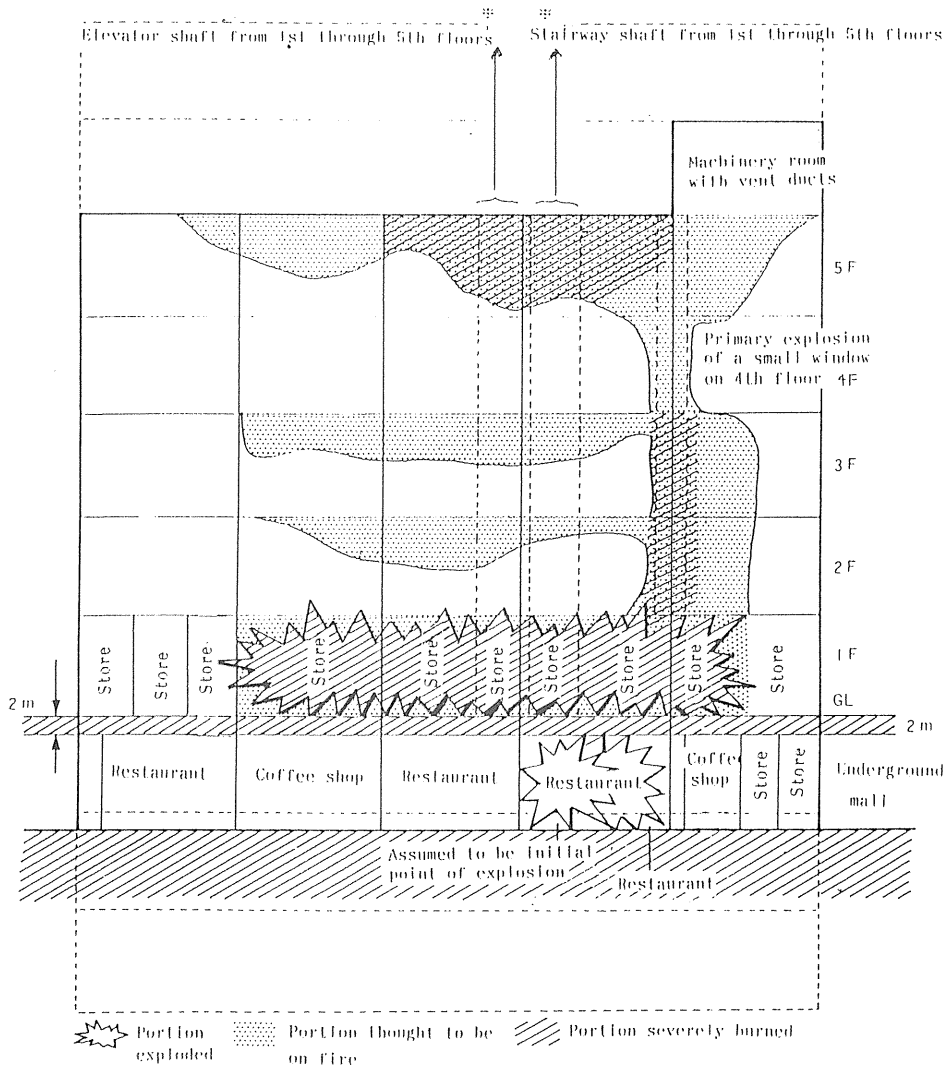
Sketch of gas explosion and fire spread in the Golden Underground Mall and Daiichi Building in the Shizuoka Prefecture (Source: Urban Underground Space Utilization Research No.11, Oct. 1990).
